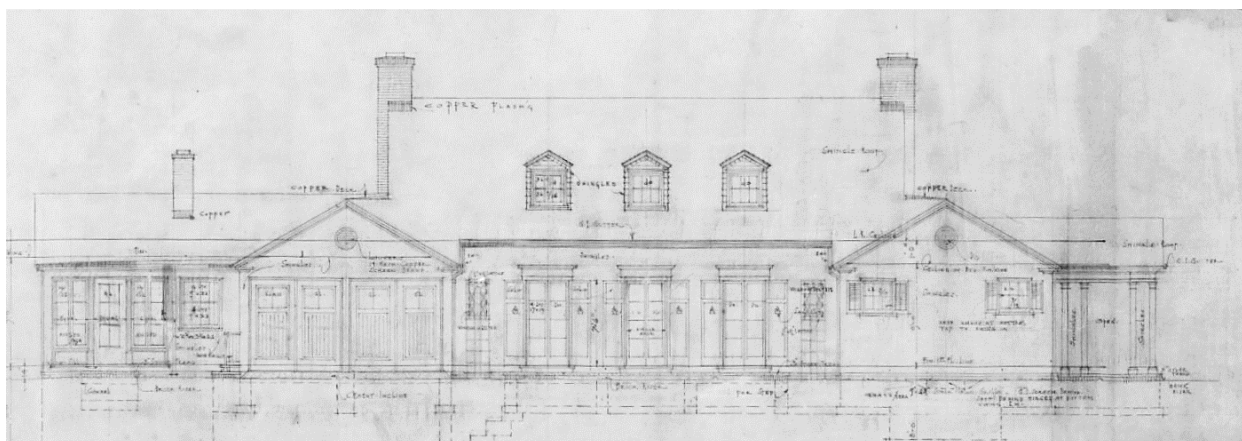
Will S. & Emmy Halle Residence, 1640 Oakwood Drive (#11), Façade West Elevation
